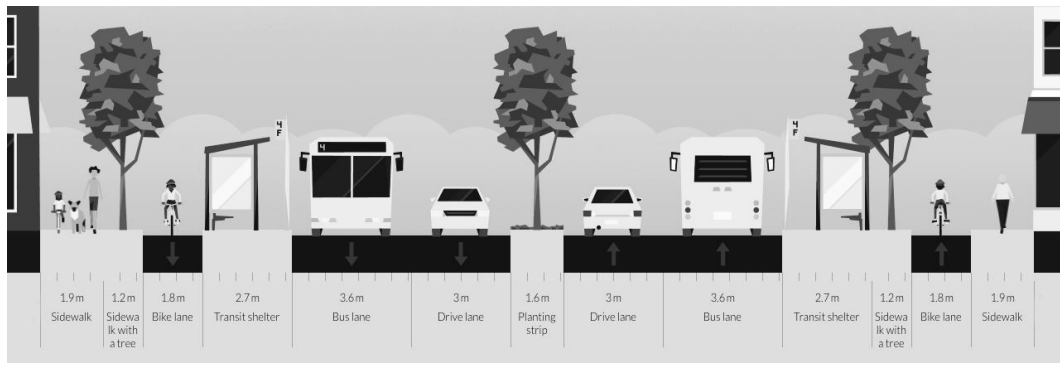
Street width: 30 m. Street consisting of sidewalks, bike lanes, space for greenery, drive lanes, transit shelters and bus lanes. Designed with streetmix.net.
